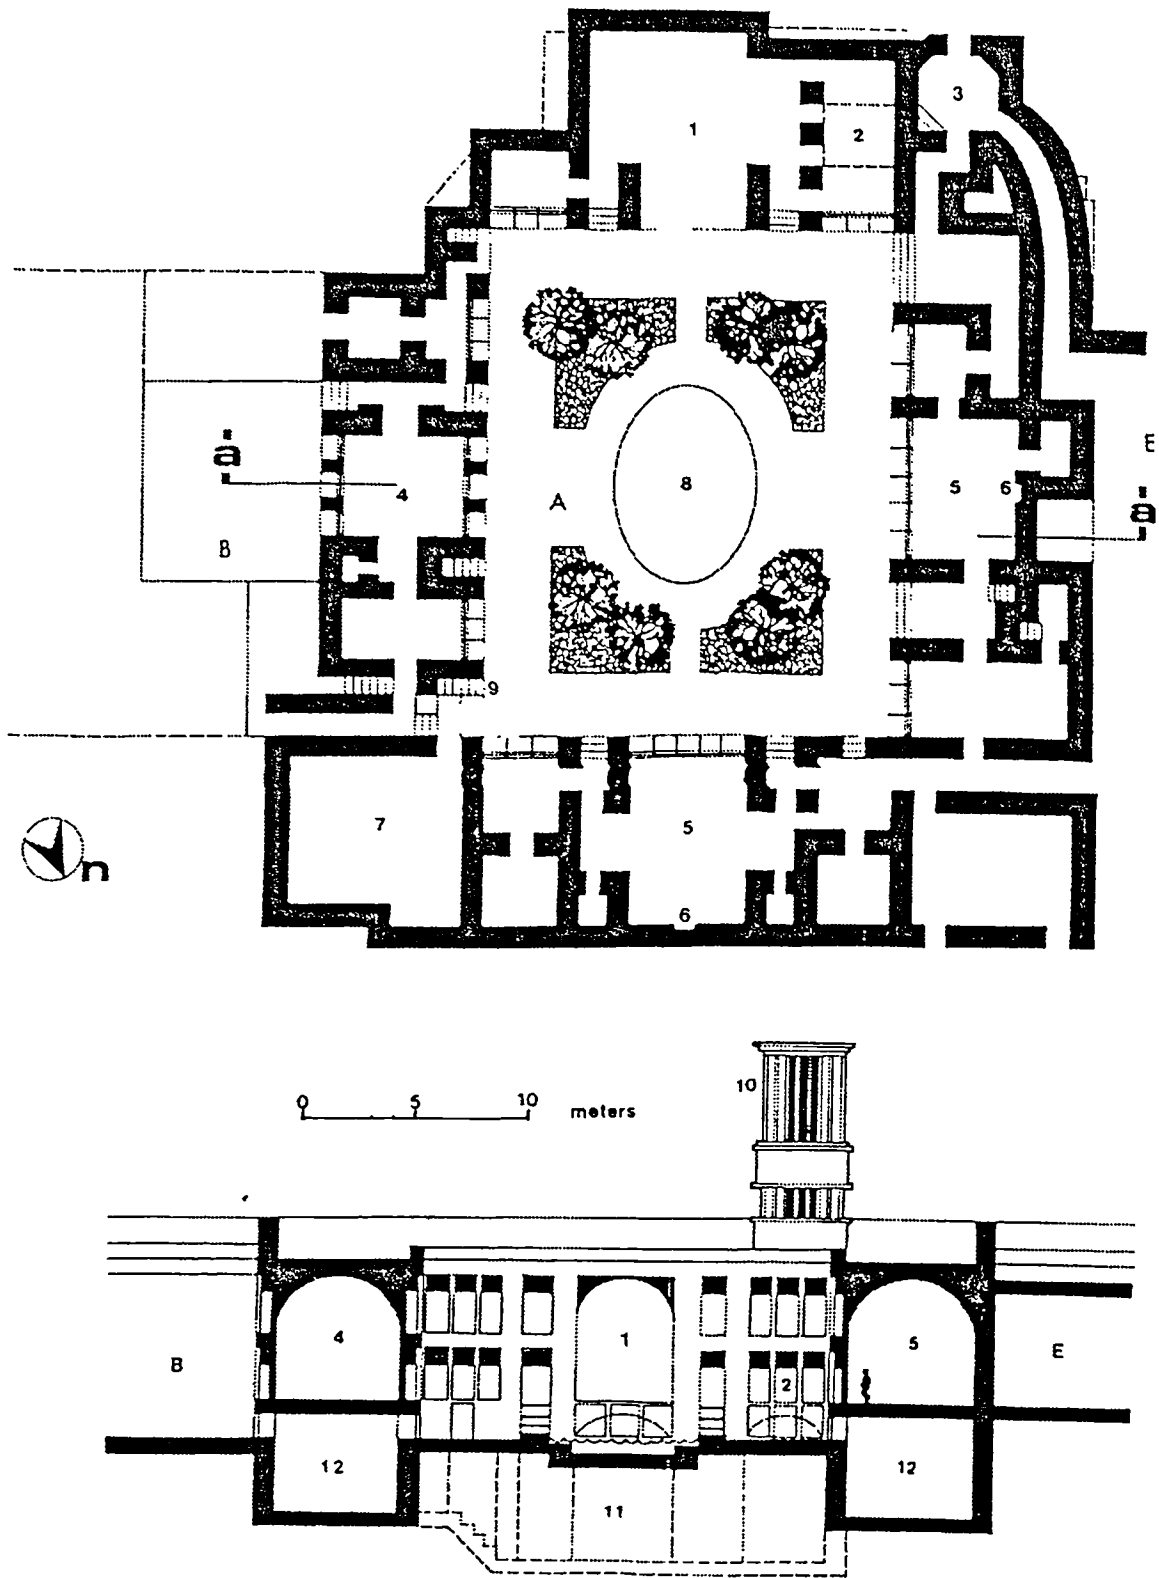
Plan and section of the Gazorgah house, Yazd. (Bonine, 1980b, p.207-209) (see P.T.O. and p.136).
